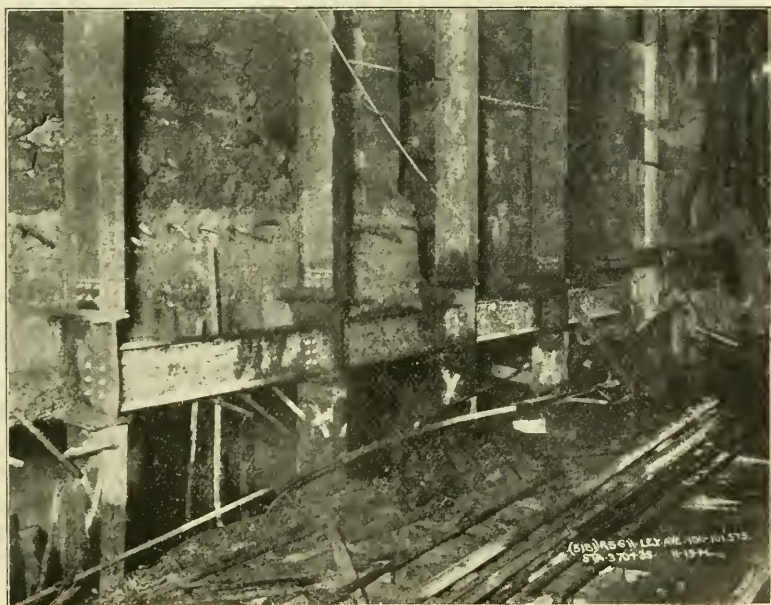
BEAM PLACED BETWEEN ROOF BEAMS TO STIFFEN THEM AND DISTRIBUTE THE LOAD ON THE SIDE-WALL.
